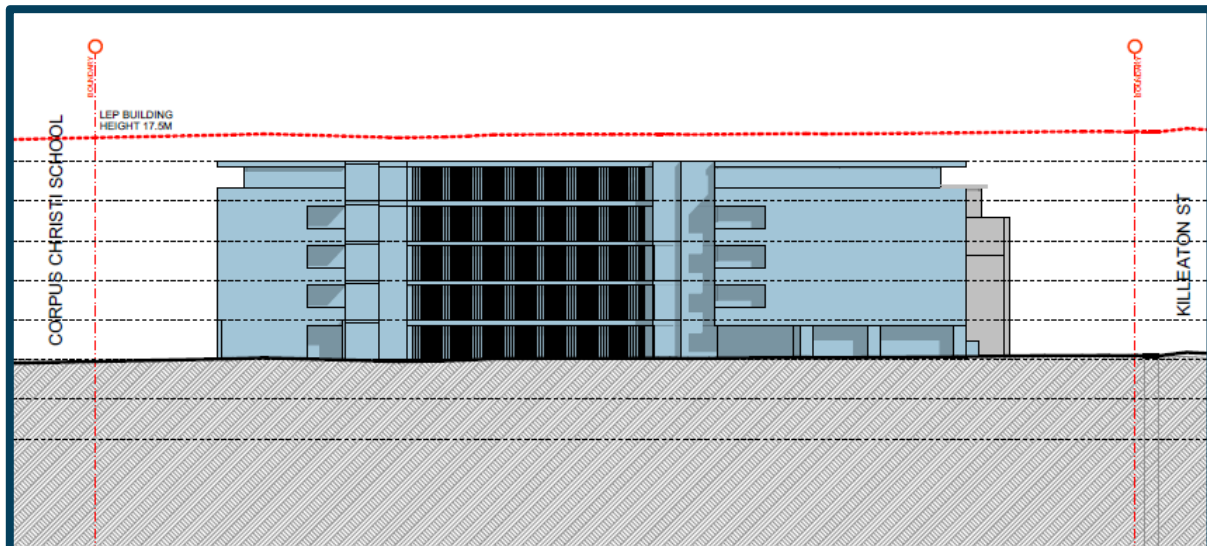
East Elevation of development concept (Mackenzie Architects, 2021)
